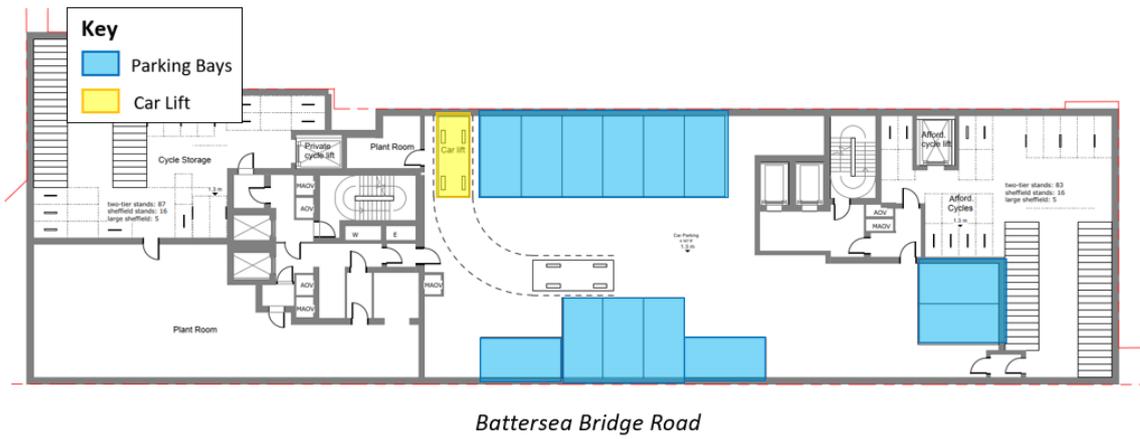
Proposed Location of Disabled Parking Bays (Lower Ground Floor Level)
